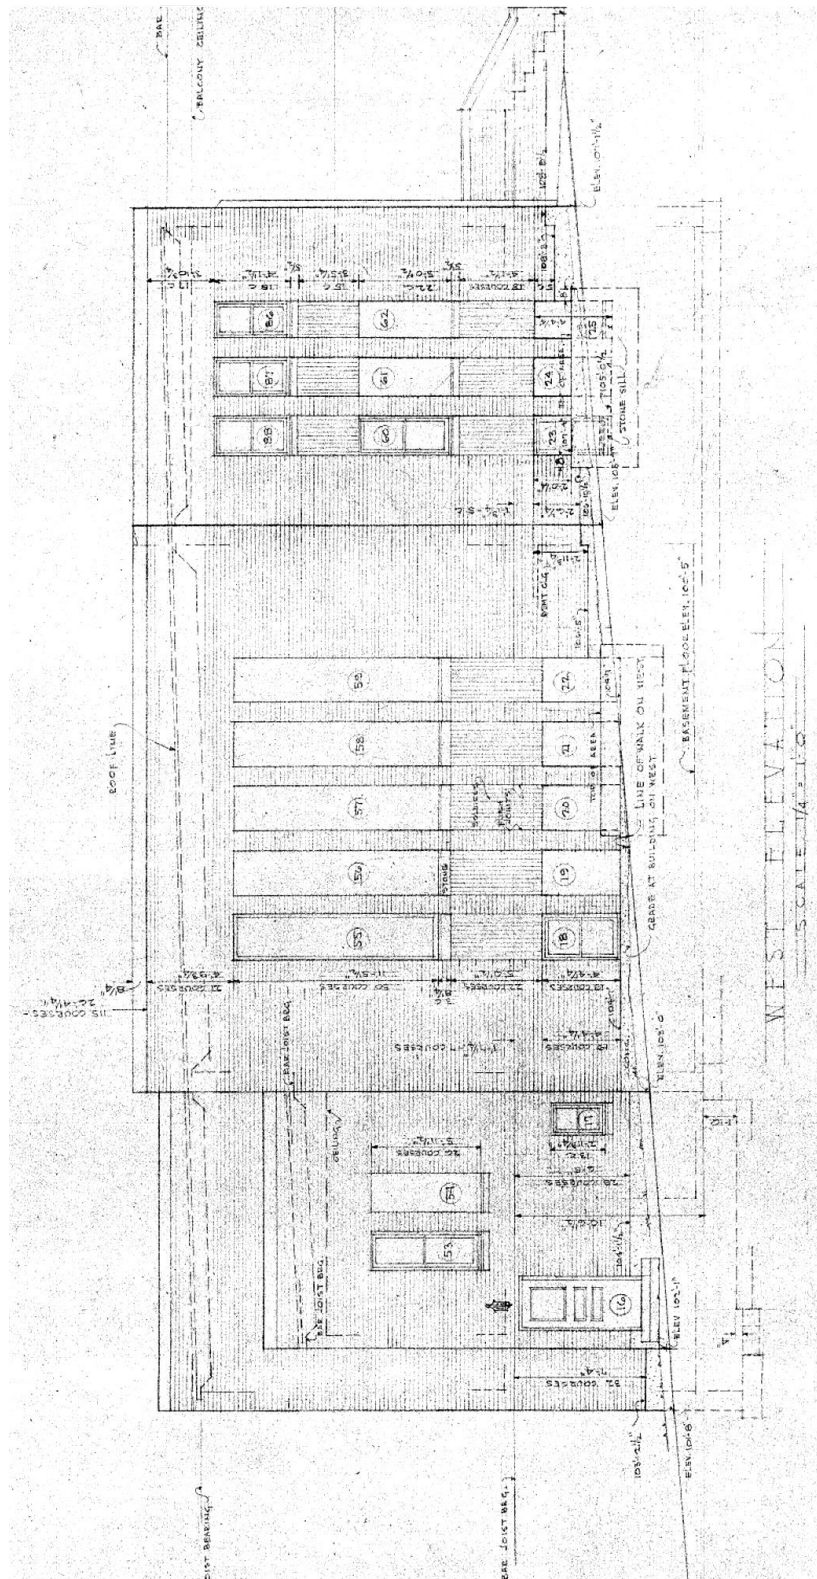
West elevation from plans drawn by David B. Toenjes.
